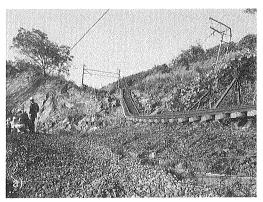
Reconstructed embankment and reinforced soil retaining wall along JR Joetsu line (site 1 in Figure 1)
